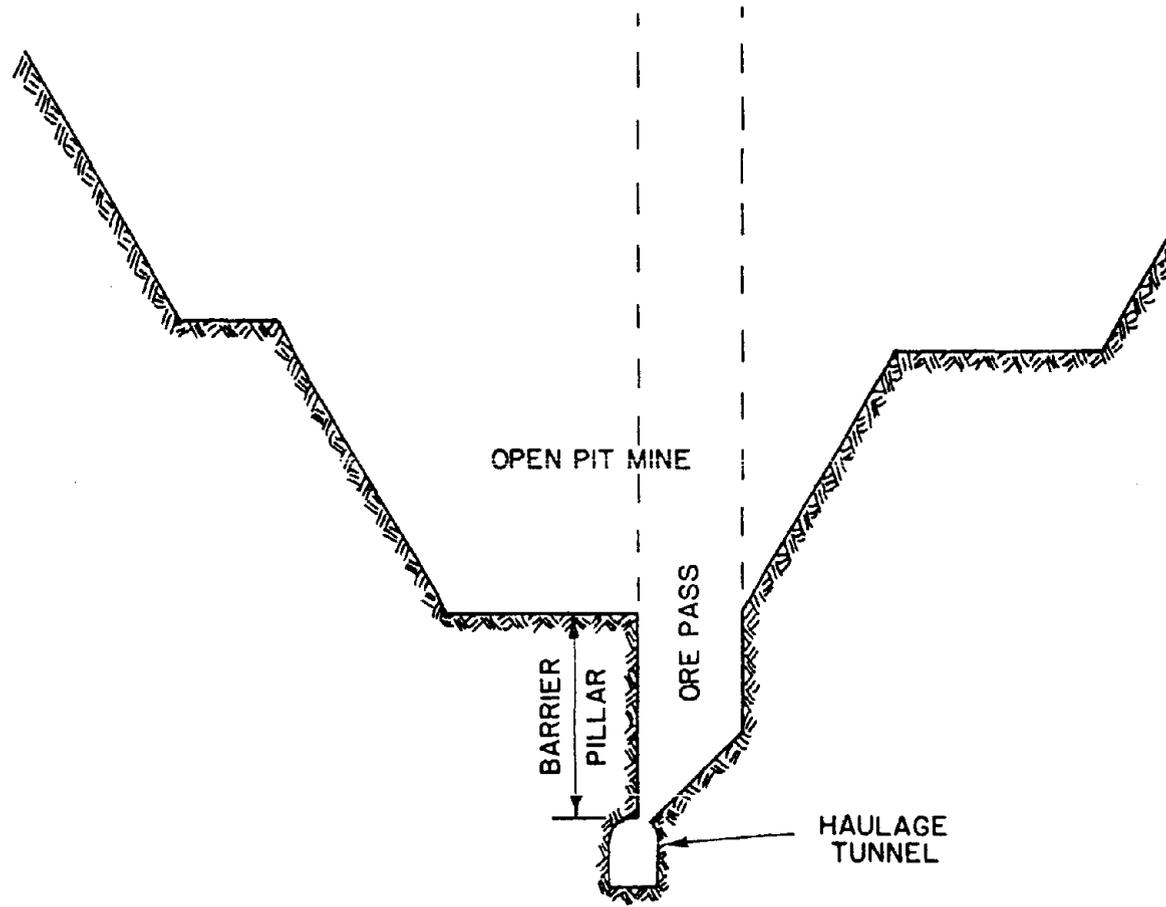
Section of an open pit mine with an ore pass showing the haulage tunnel and barrier pillar
